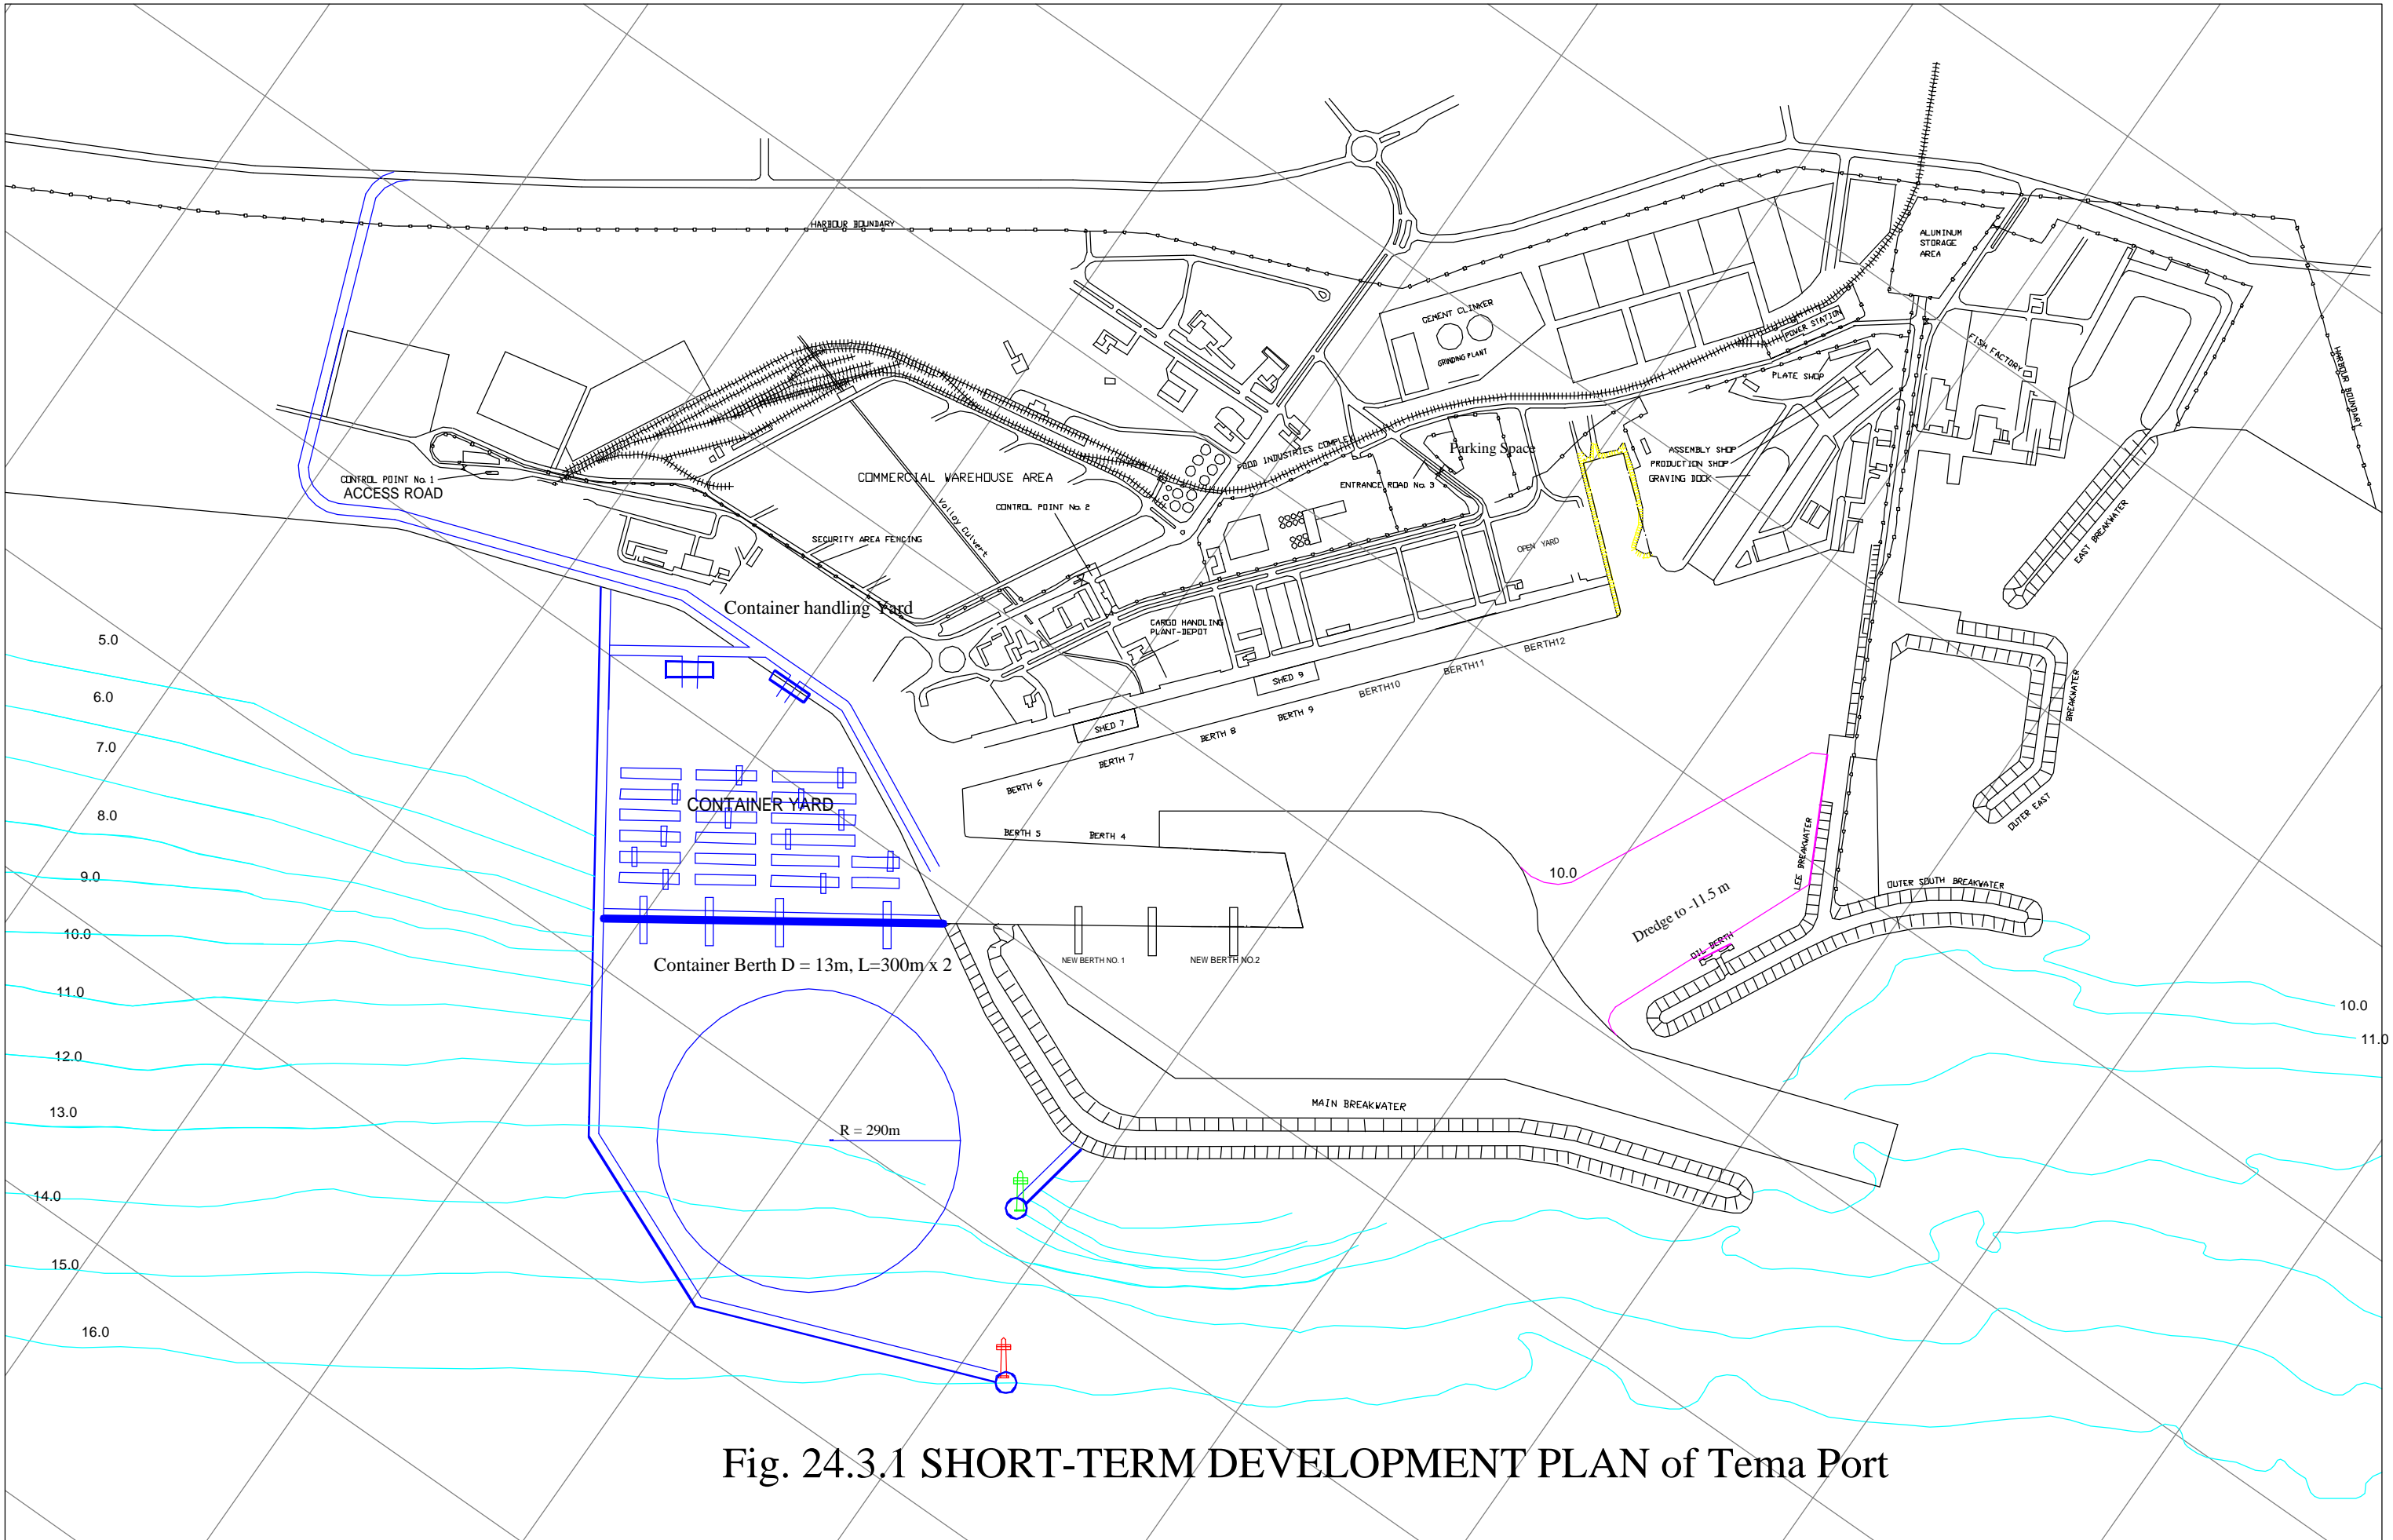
SHORT-TERM DEVELOPMENT PLAN of Tema Port
